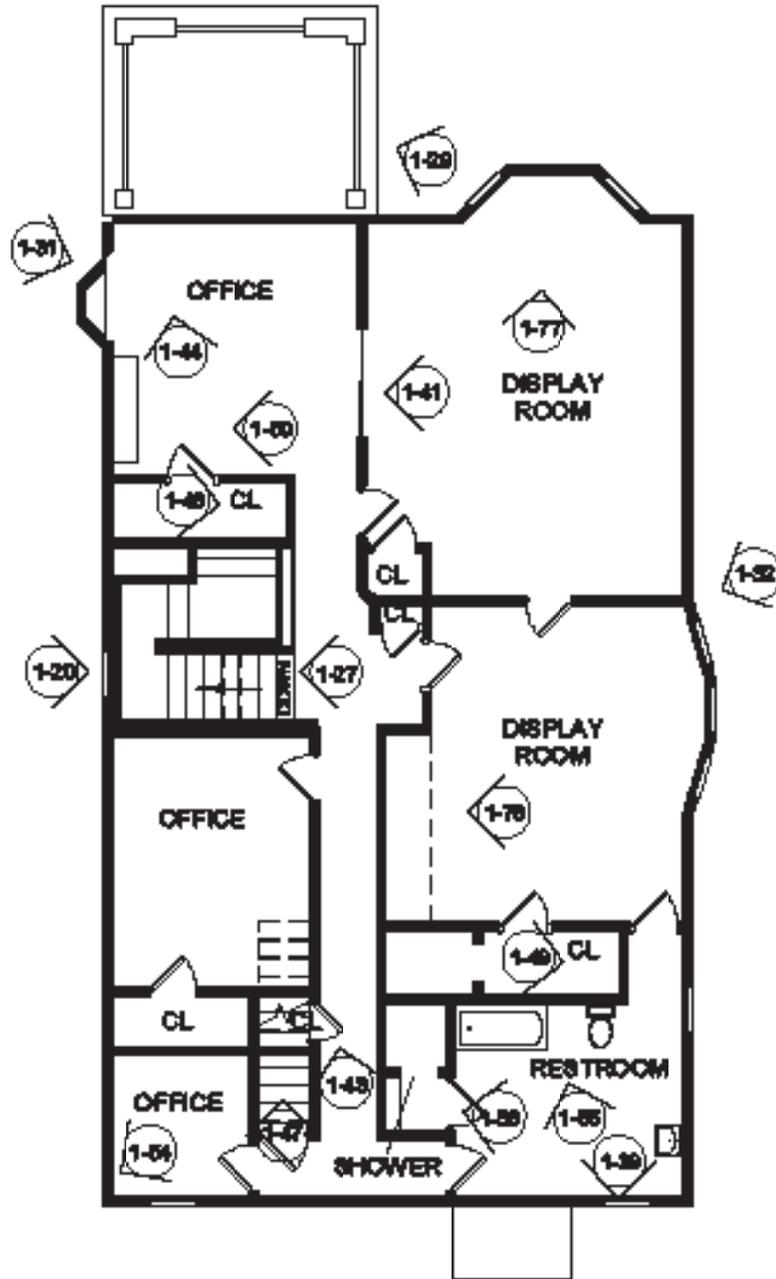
First Floor Plan, 2020 (source: Ratio)
